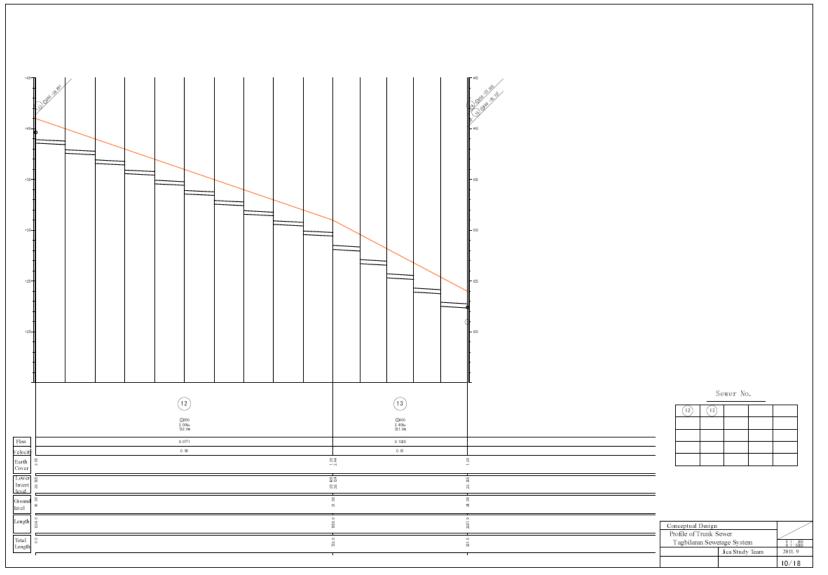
Profile of Trunk Sewer (Tagbilaran Sewerage System)
